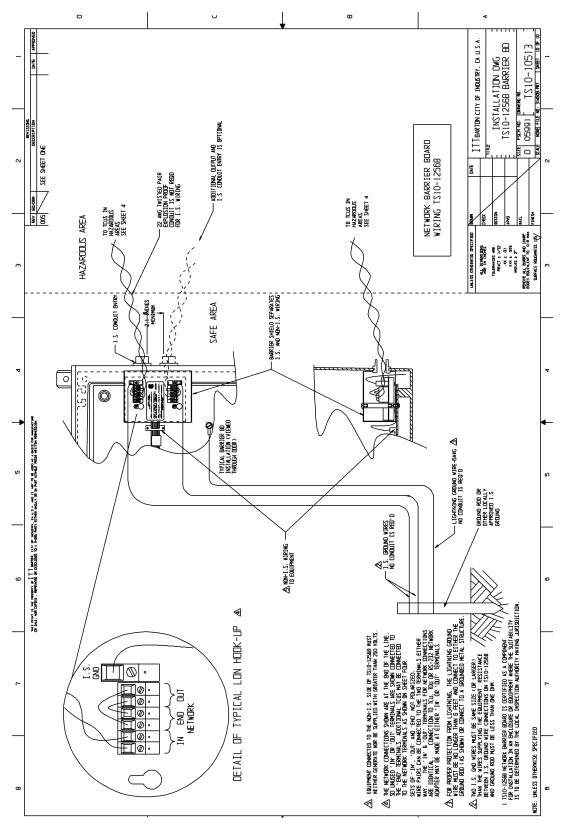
Wiring Drawing TS10-10513 (10/10)
